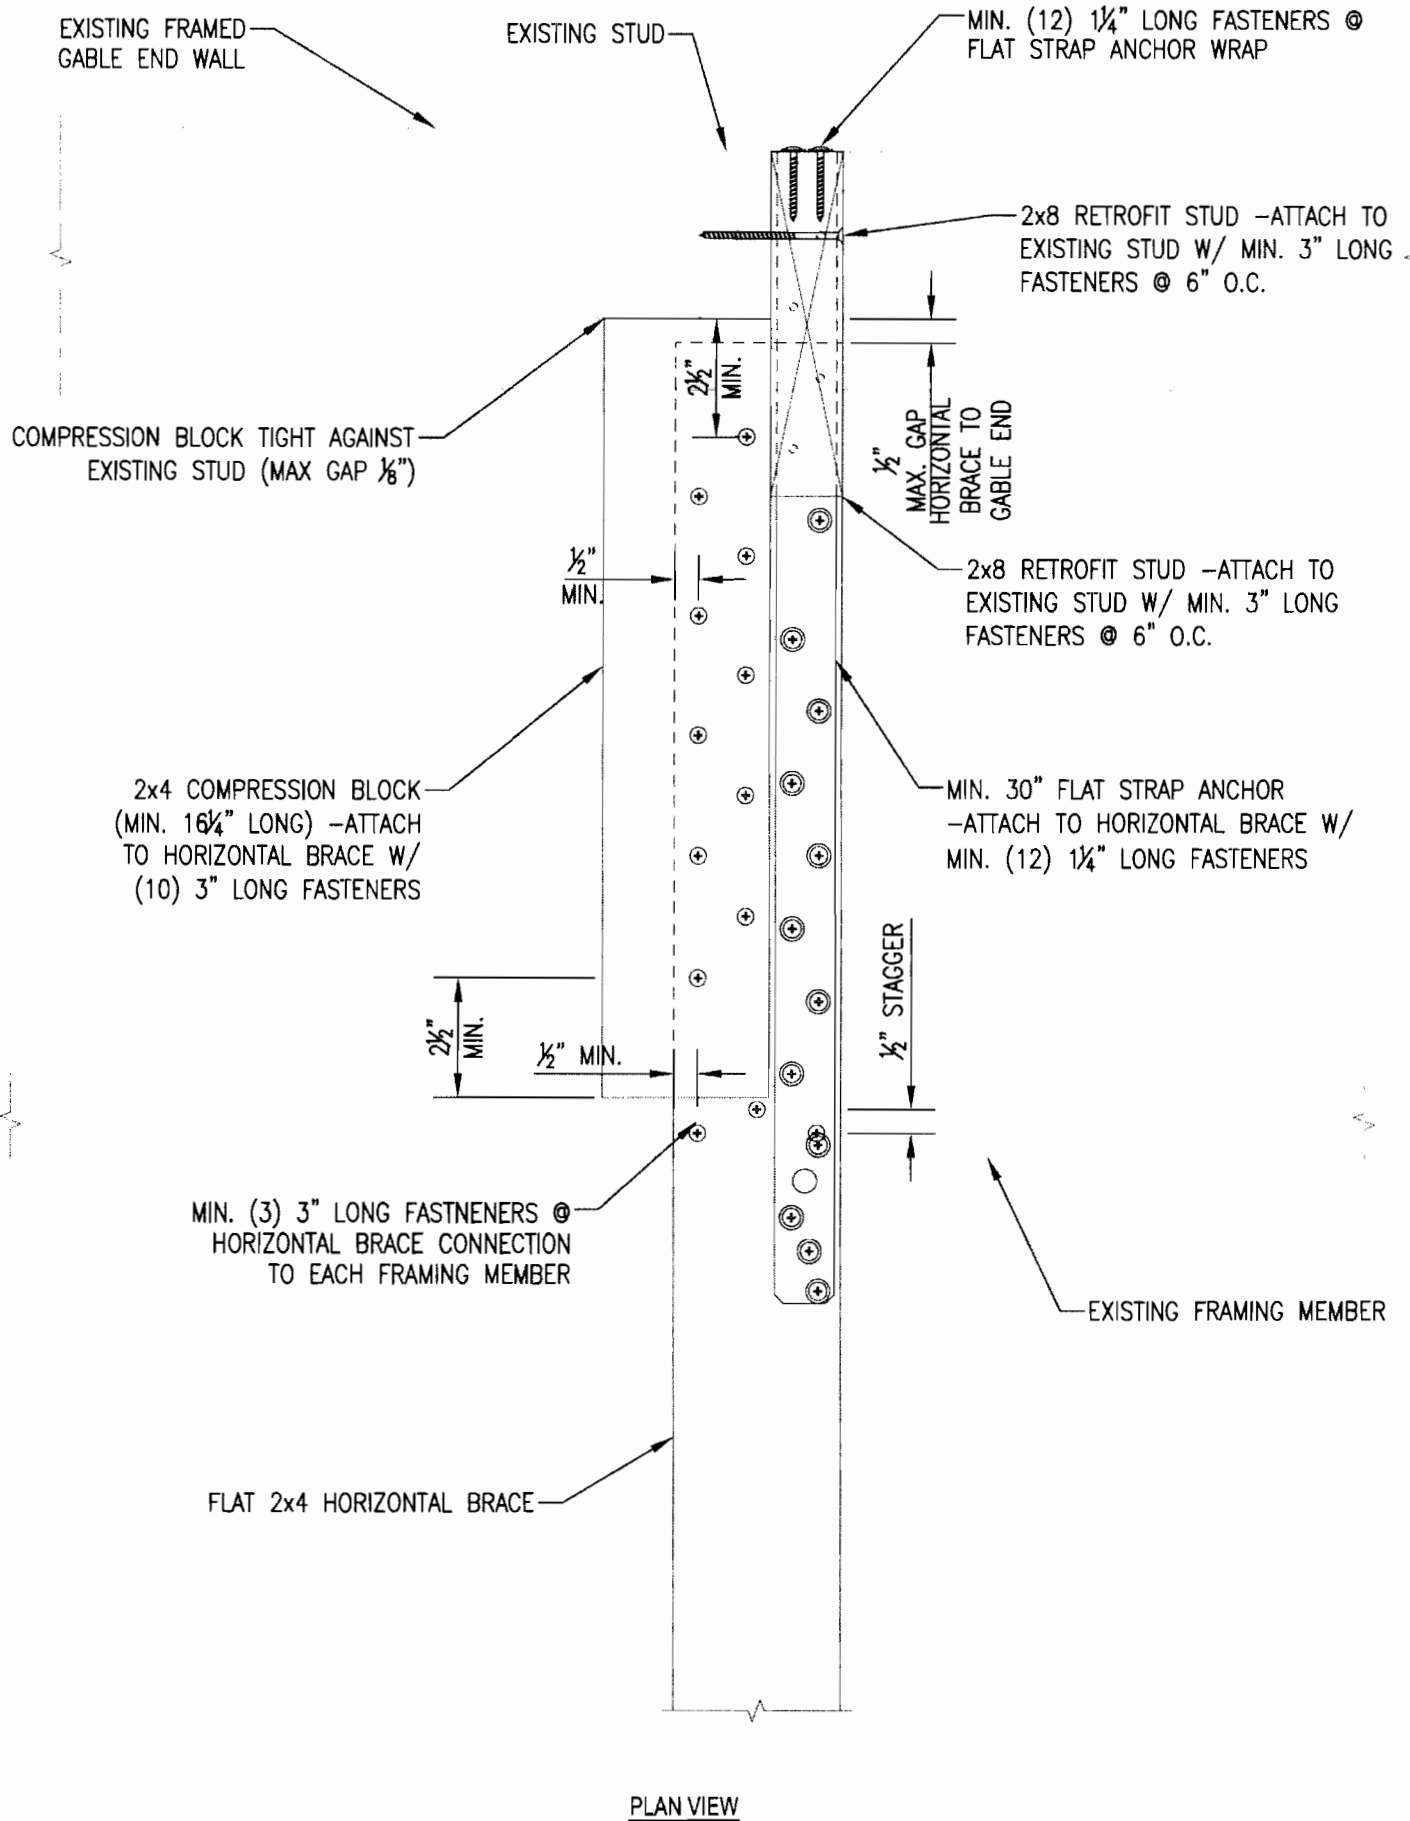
DETAILS OF STRAP & COMPRESSION BLOCK INSTALLATION - 2x8 RETROFIT STUD
